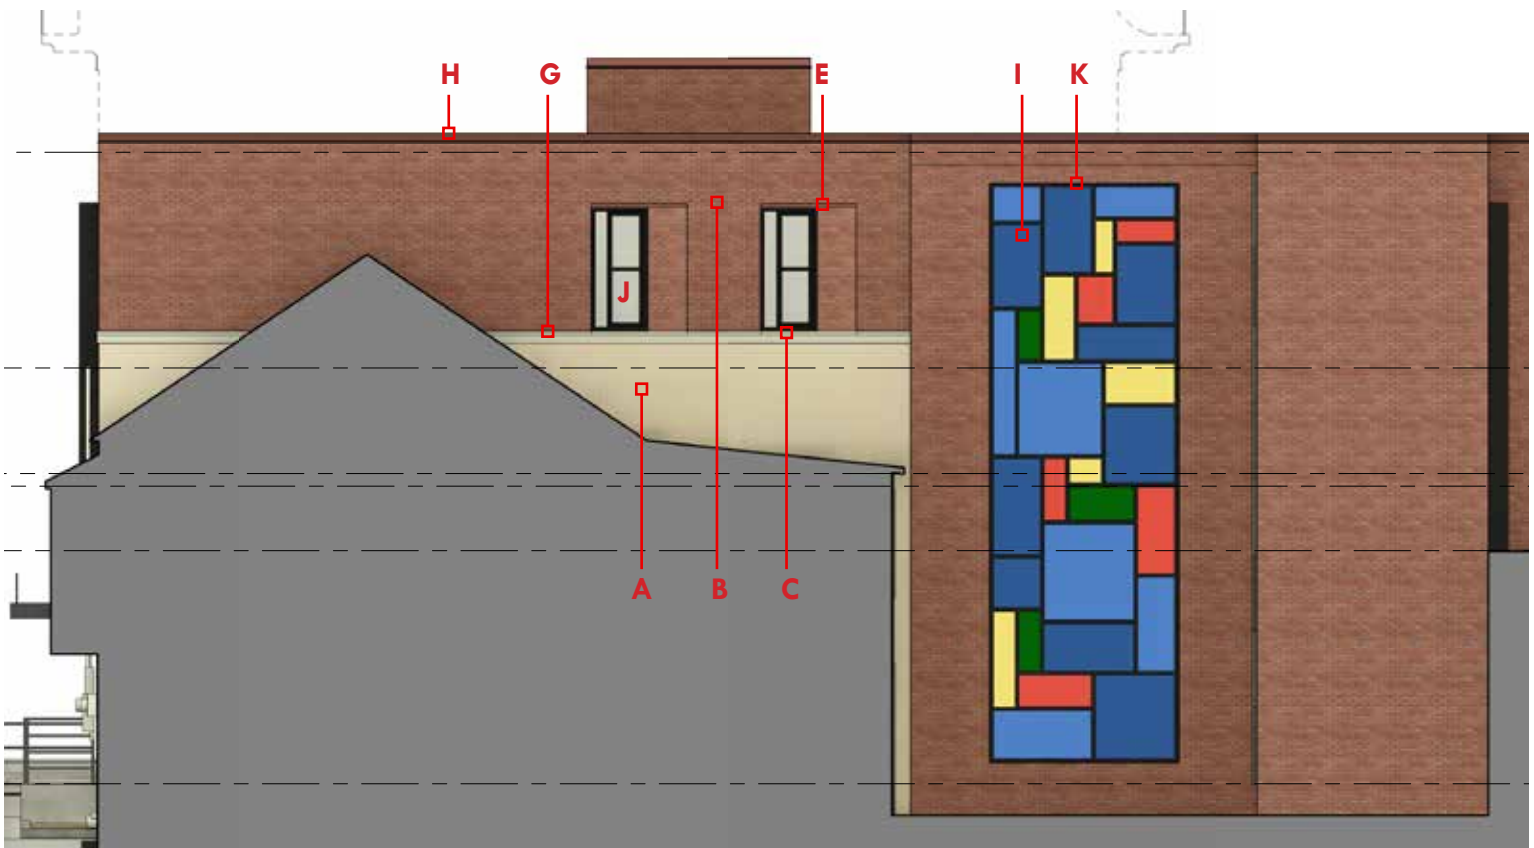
Proposed 335-339 West Fourth Street, East Elevation; Drawn by Spillman Farmer Architects
